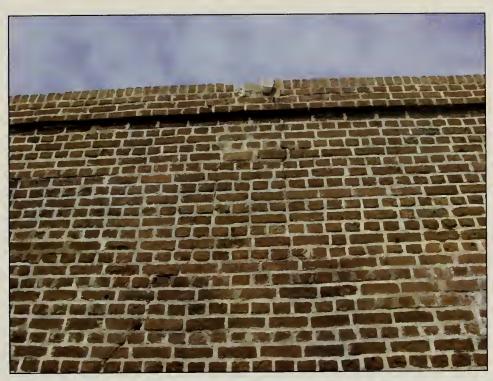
Masonry crack, Right Flank, March 2009
